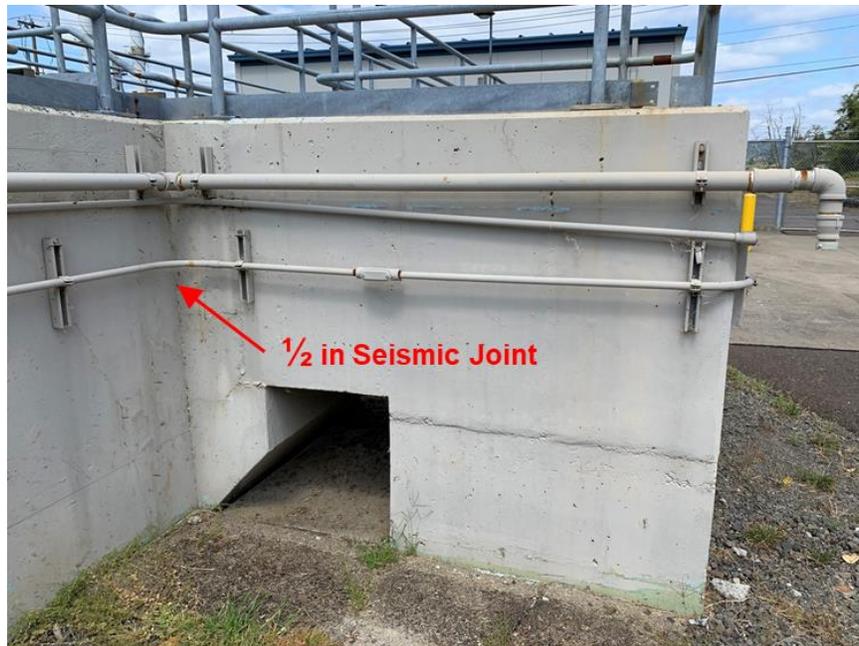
Sedimentation Basins Effluent Structure (Outlet Basin Structure)
